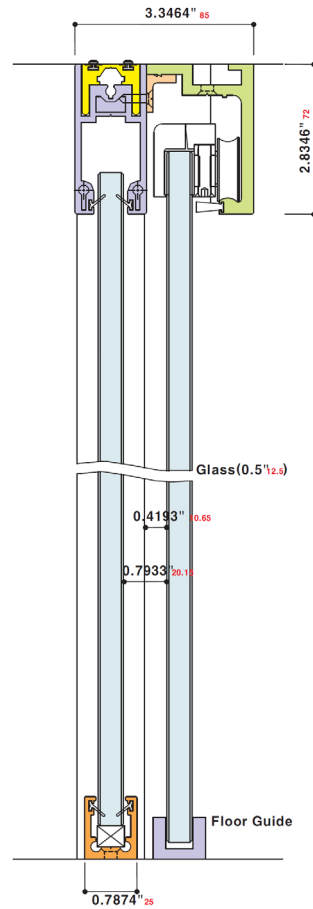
TYPICAL CROSS-SECTION OF SLIDING DOOR
